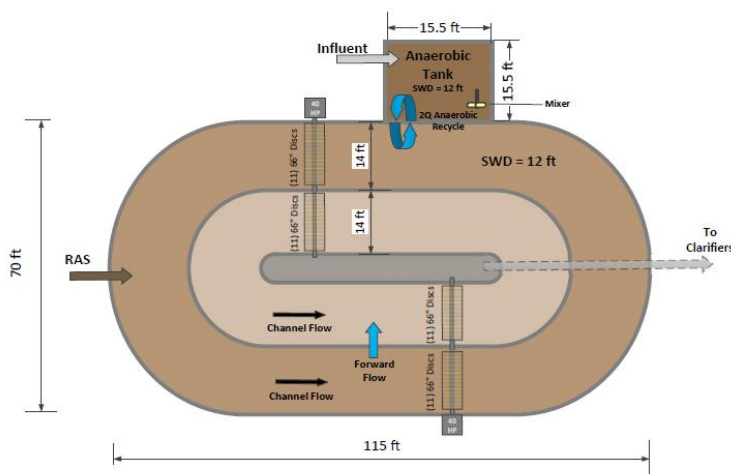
Evoqua Oxidation Ditch Proposal Layout
